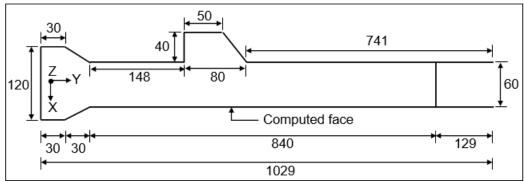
Plan view of the mold for the column element (h = 60 cm)
